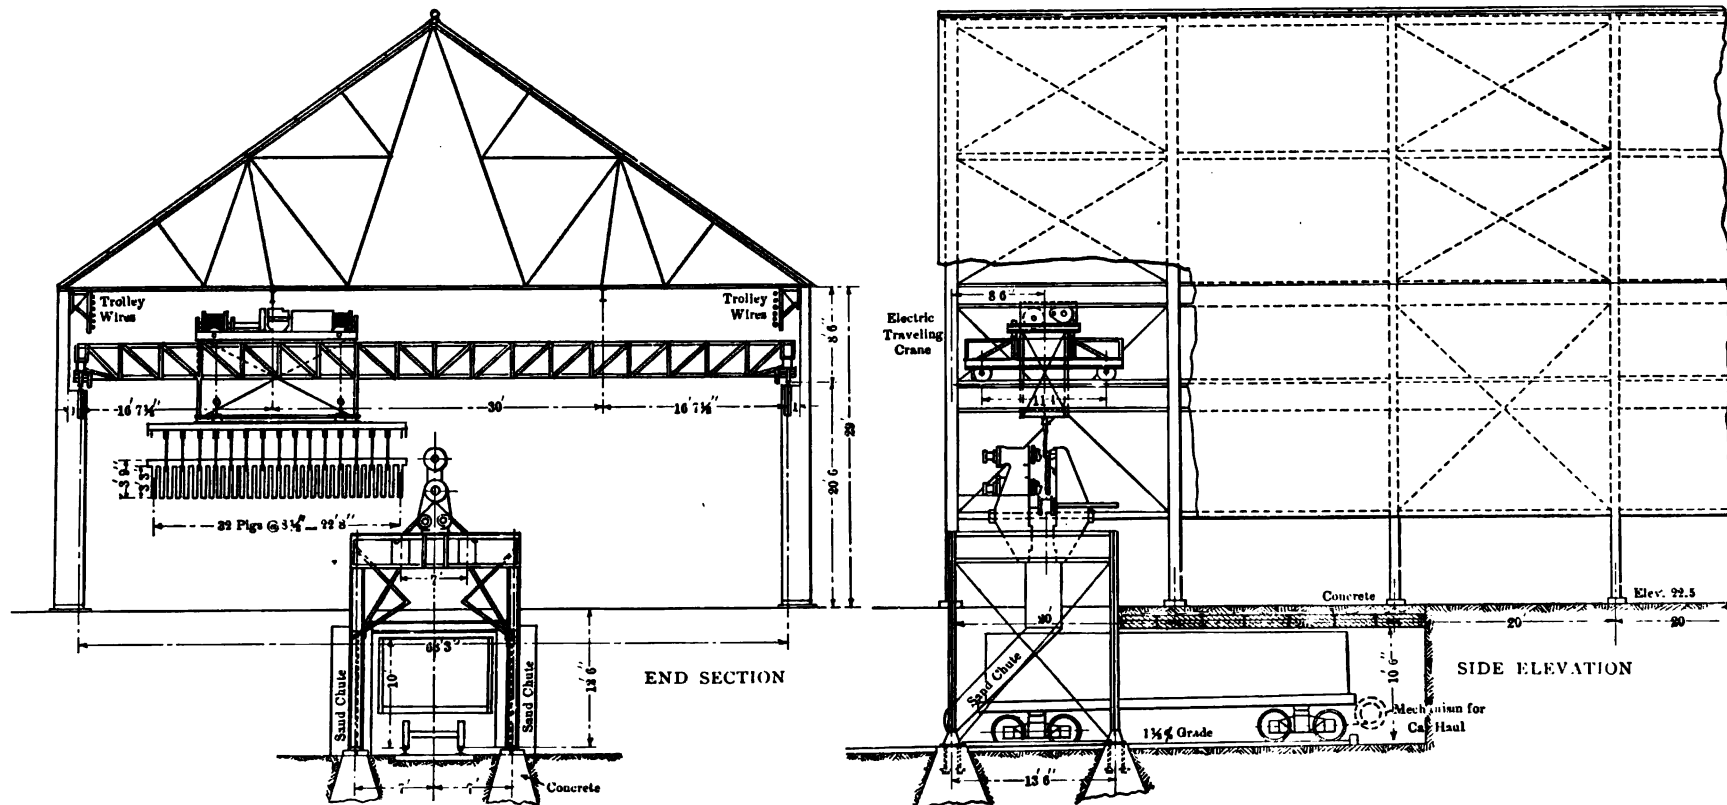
END SECTION AND SIDE ELEVATION OF CAST-HOUSE.
